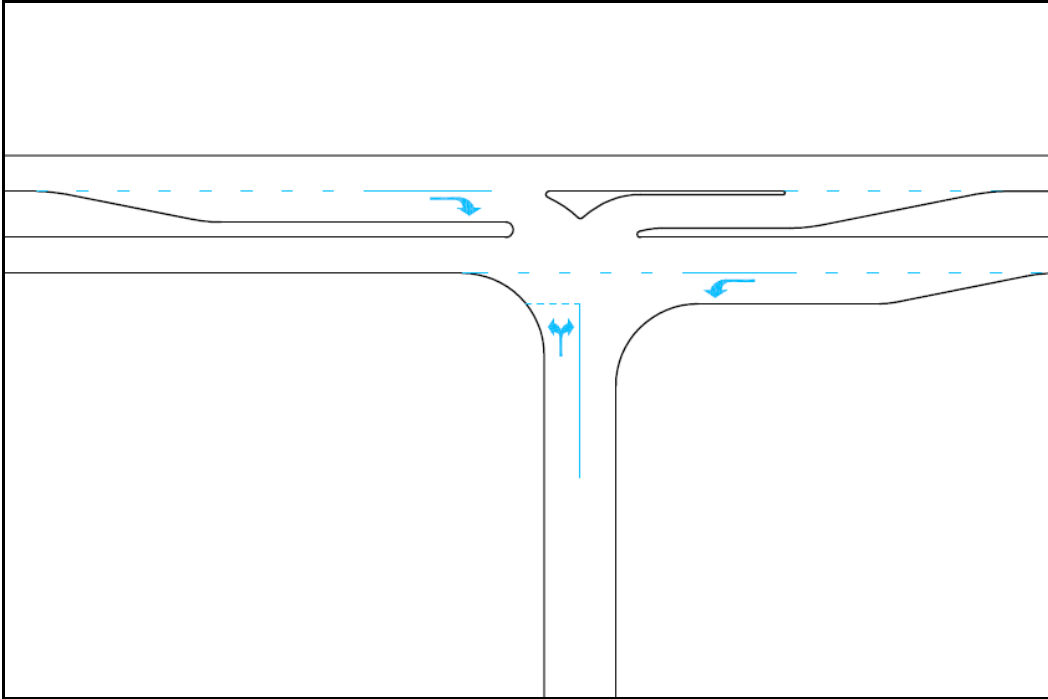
Moranbah Access Road/Peak Downs Highway – (Proposed Seagull Form)
